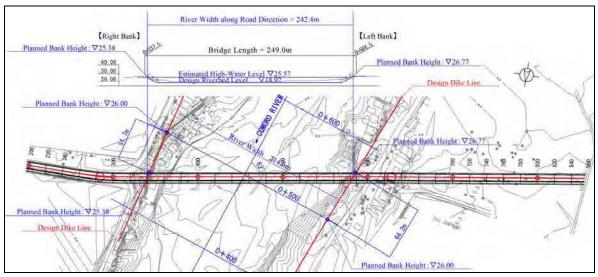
Bridge Length, Planned Bank Height & River Condition
